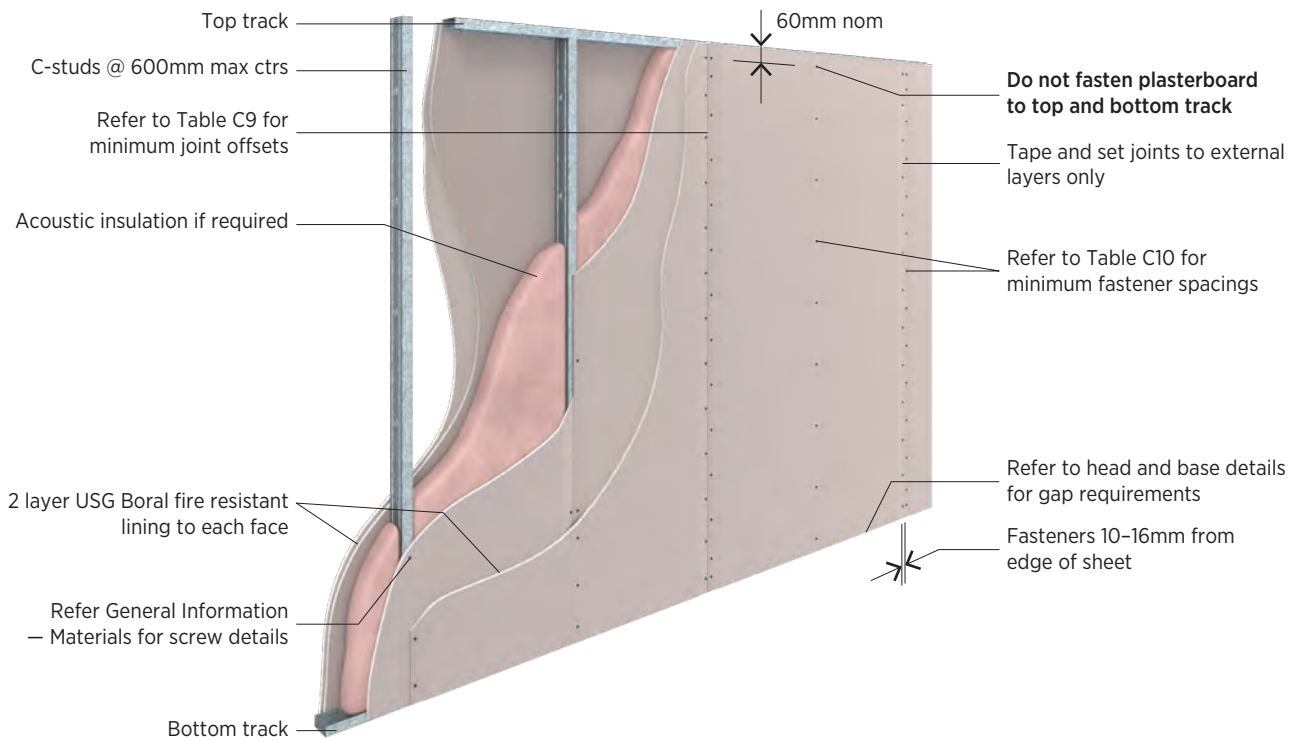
Fire Rated Steel Stud - Vertical Fixing - Multiple Layer
